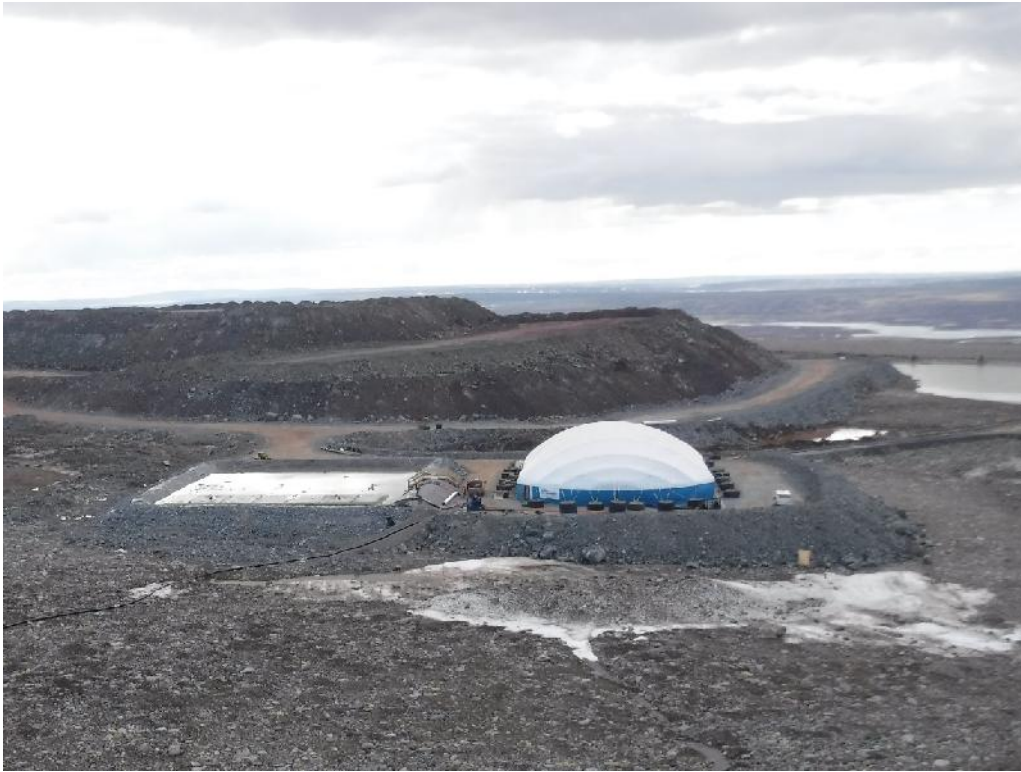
Waste Rock Facility Water Treatment Plant – June 2018
